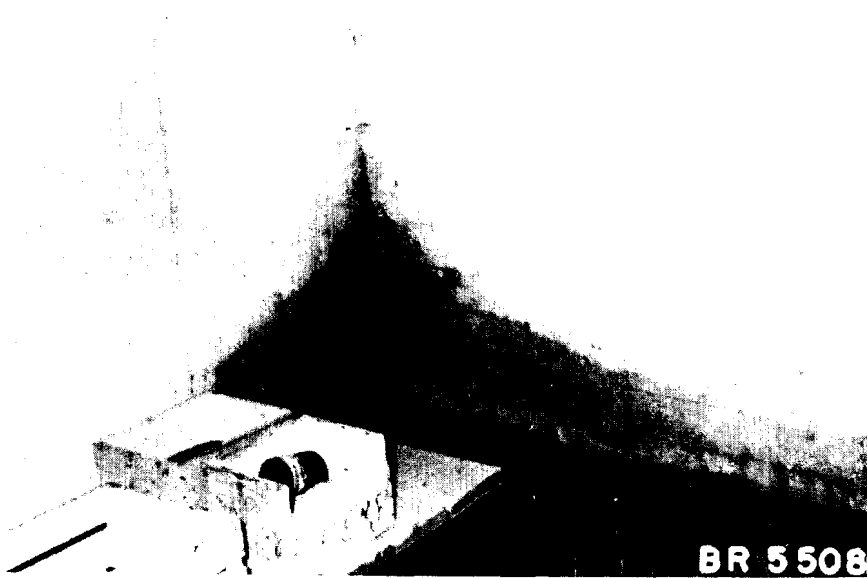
Leakage at Junction of Basement Wall and Floor (location (2) on basement plan, Fig. 22)
